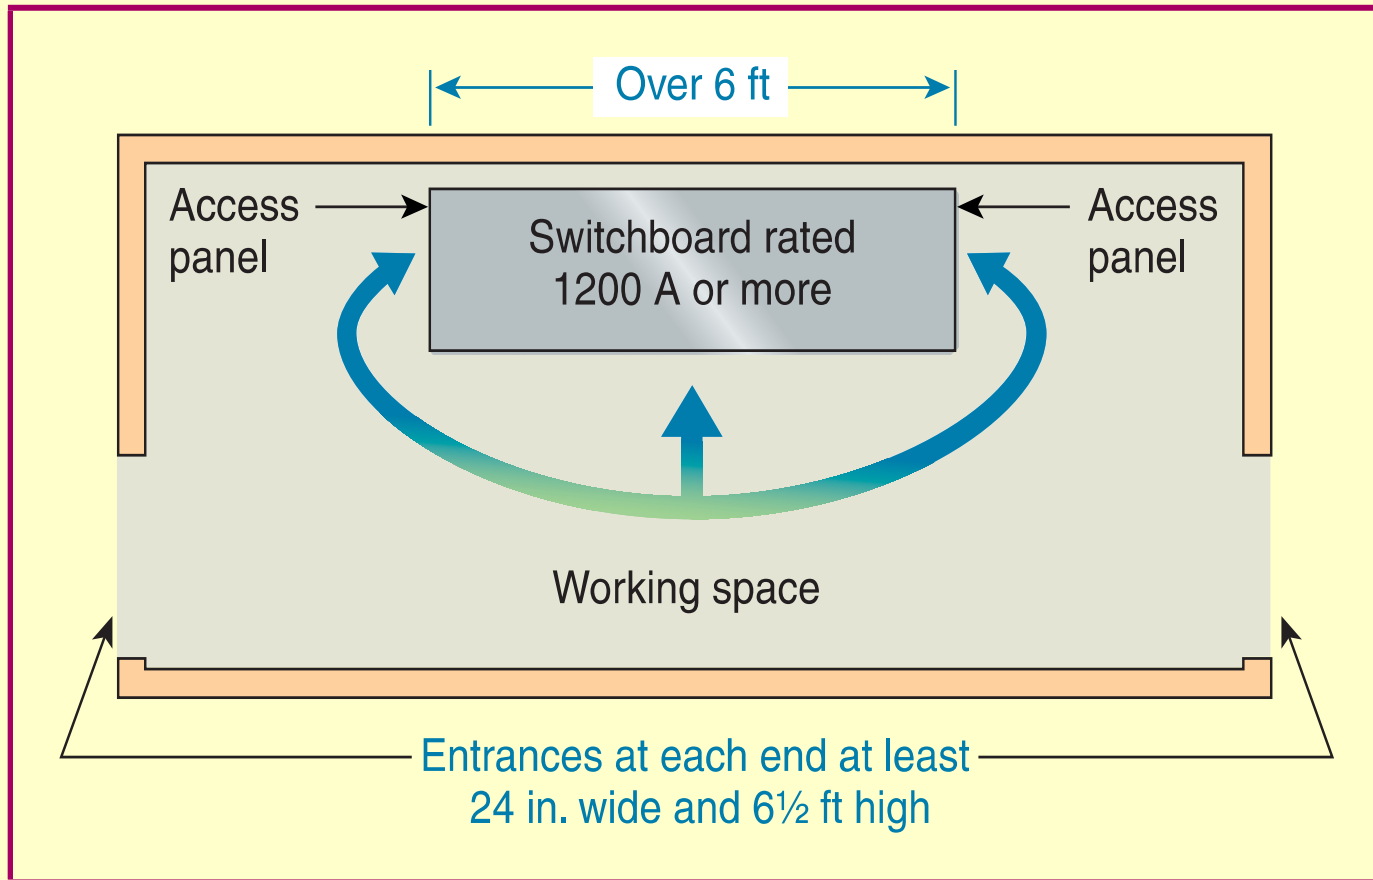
For equipment rated 1200 amperes or more and over 6 feet wide, one entrance not less than 24 inches wide and 6½ feet high is required at each end.
